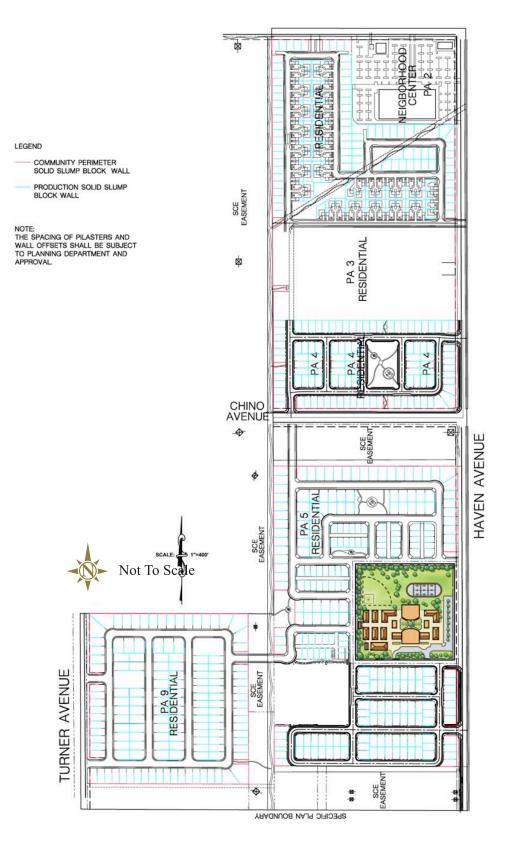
Conceptual Community Wall Plan (Illustrative only, subject to change during ttm approval)
